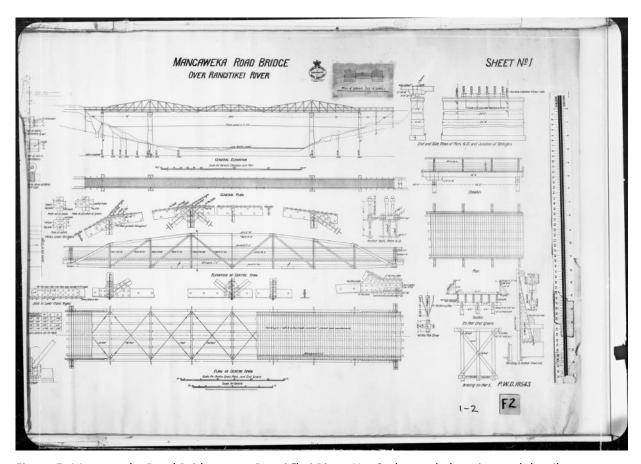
Mangaweka Road Bridge, over Rangitīkei River, No. 2 plan and elevation and details of cantilevers, Mangaweka. E Jackson, Specification 18543, PWD 18543, 1899, Code R25281081, Box 11, Part 2, Archives New Zealand
